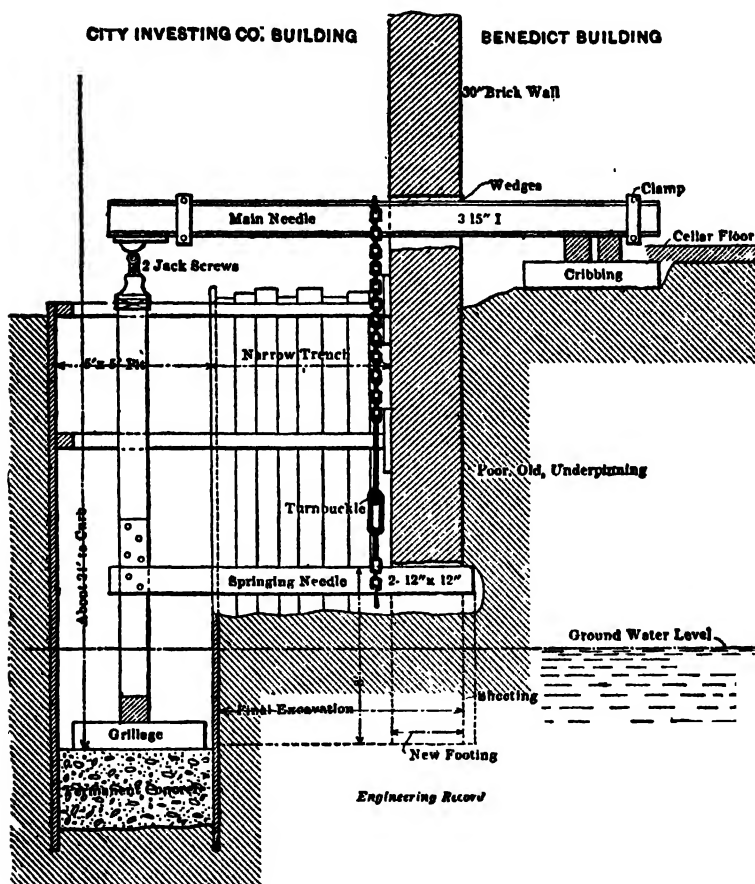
Underpinning Methods for Benedict Building, New York.
